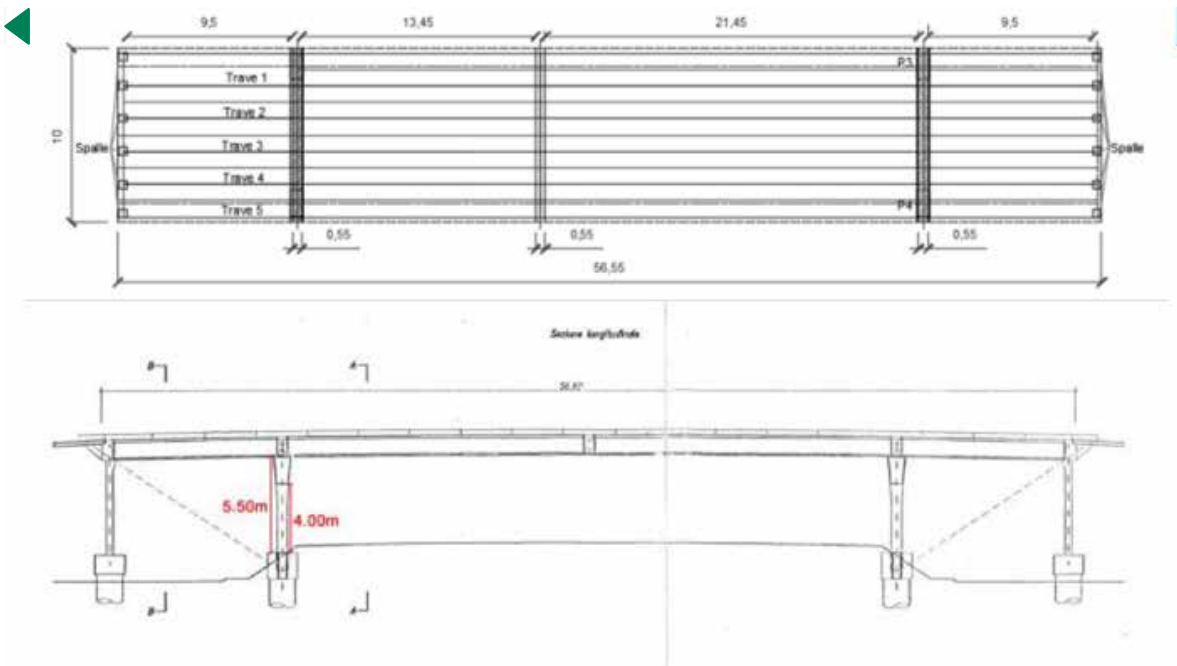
Plan view and cross section of the bridge / Pianta e sezione del cavalcavia.
